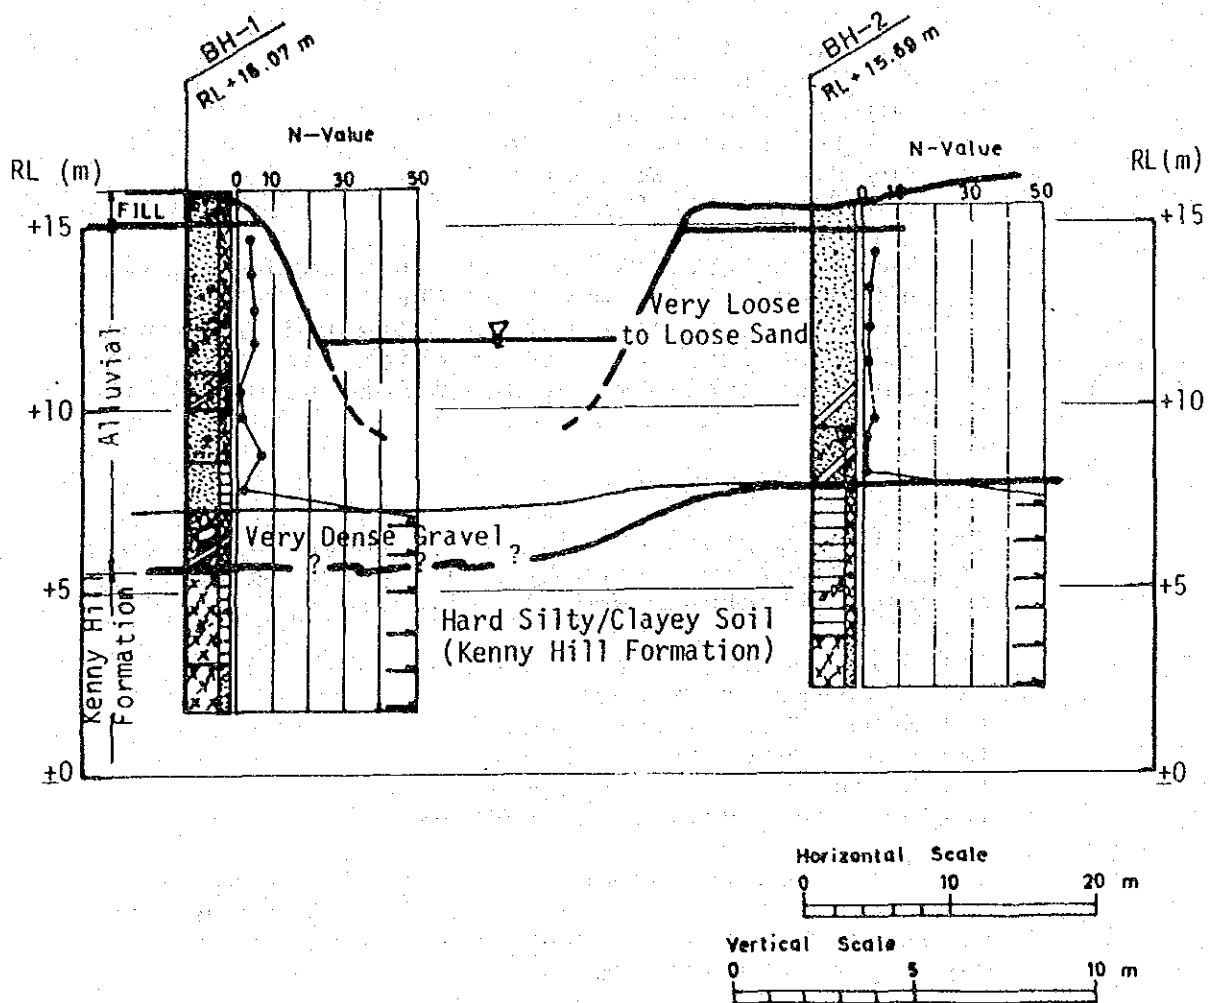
Soil Profile at Klang River Bridge Site
